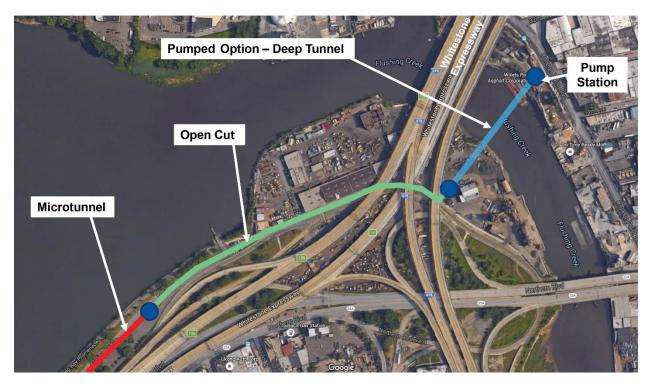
Layout of Alternative 7-2b – Extension of the BB HLI Consolidation Conduit to Address from Flushing Creek Outfall TI-011
